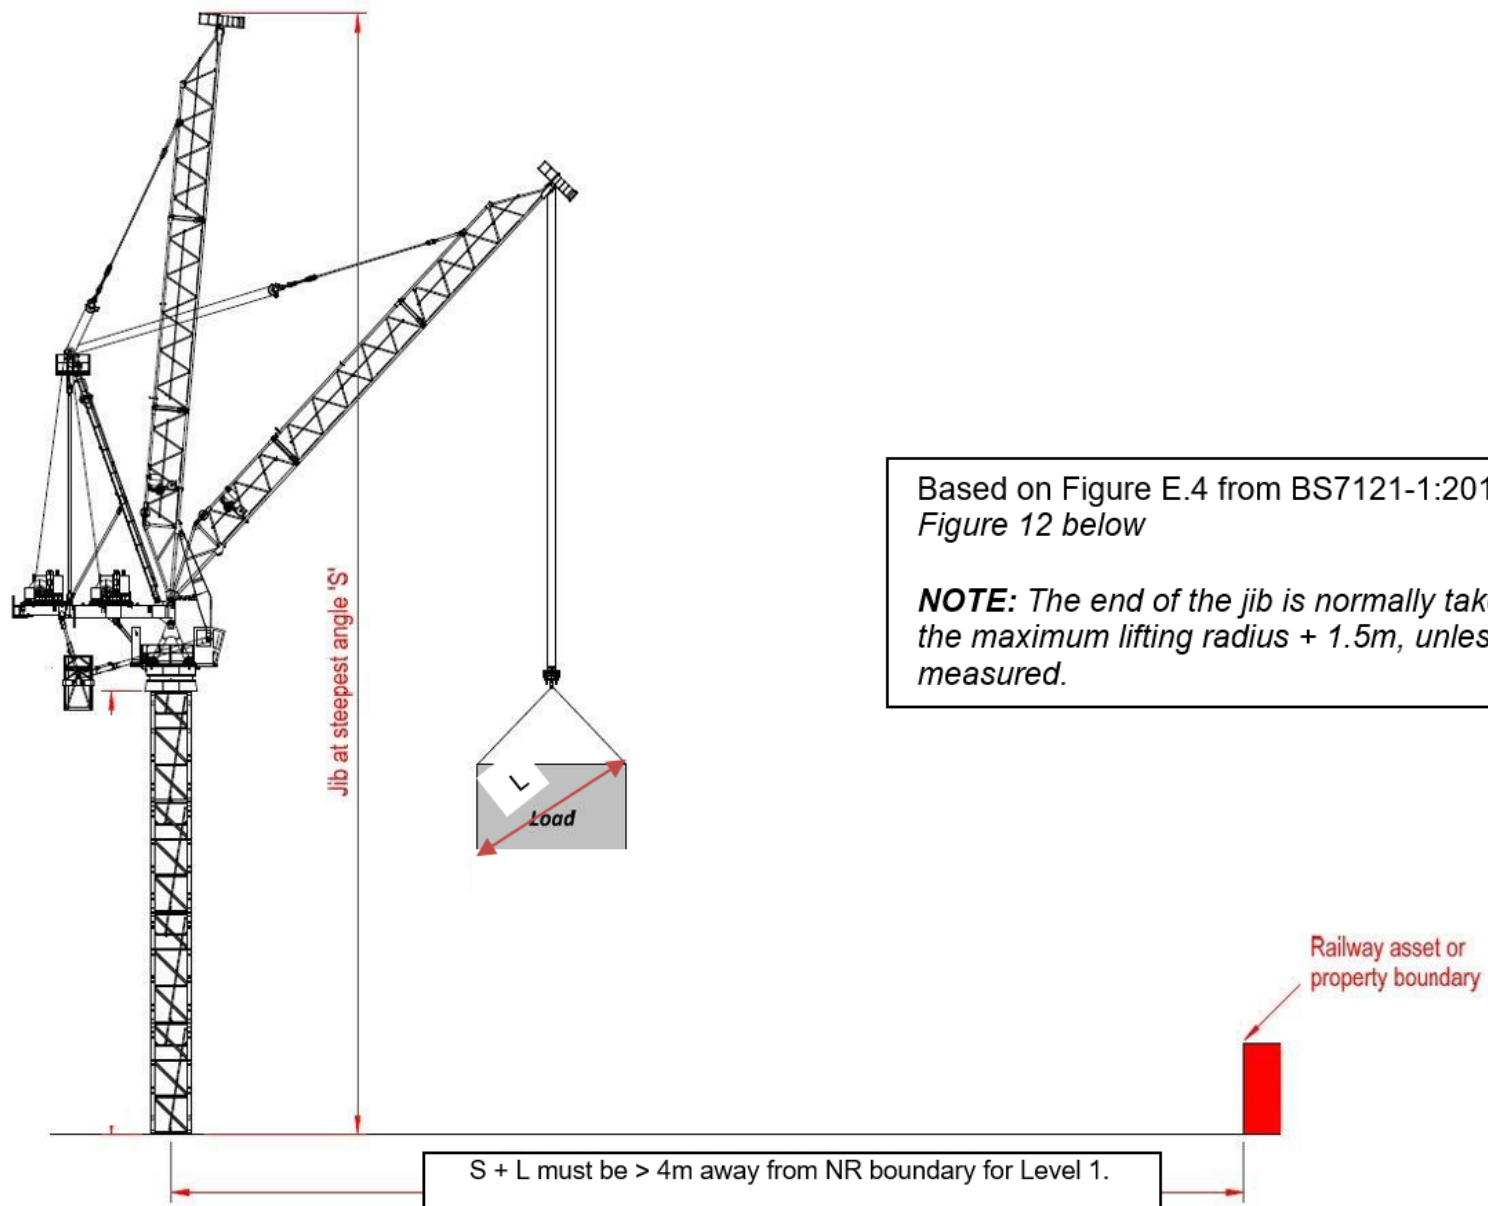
Minimum Collapse Distance – Luffing Jib (horizontal slung load)
